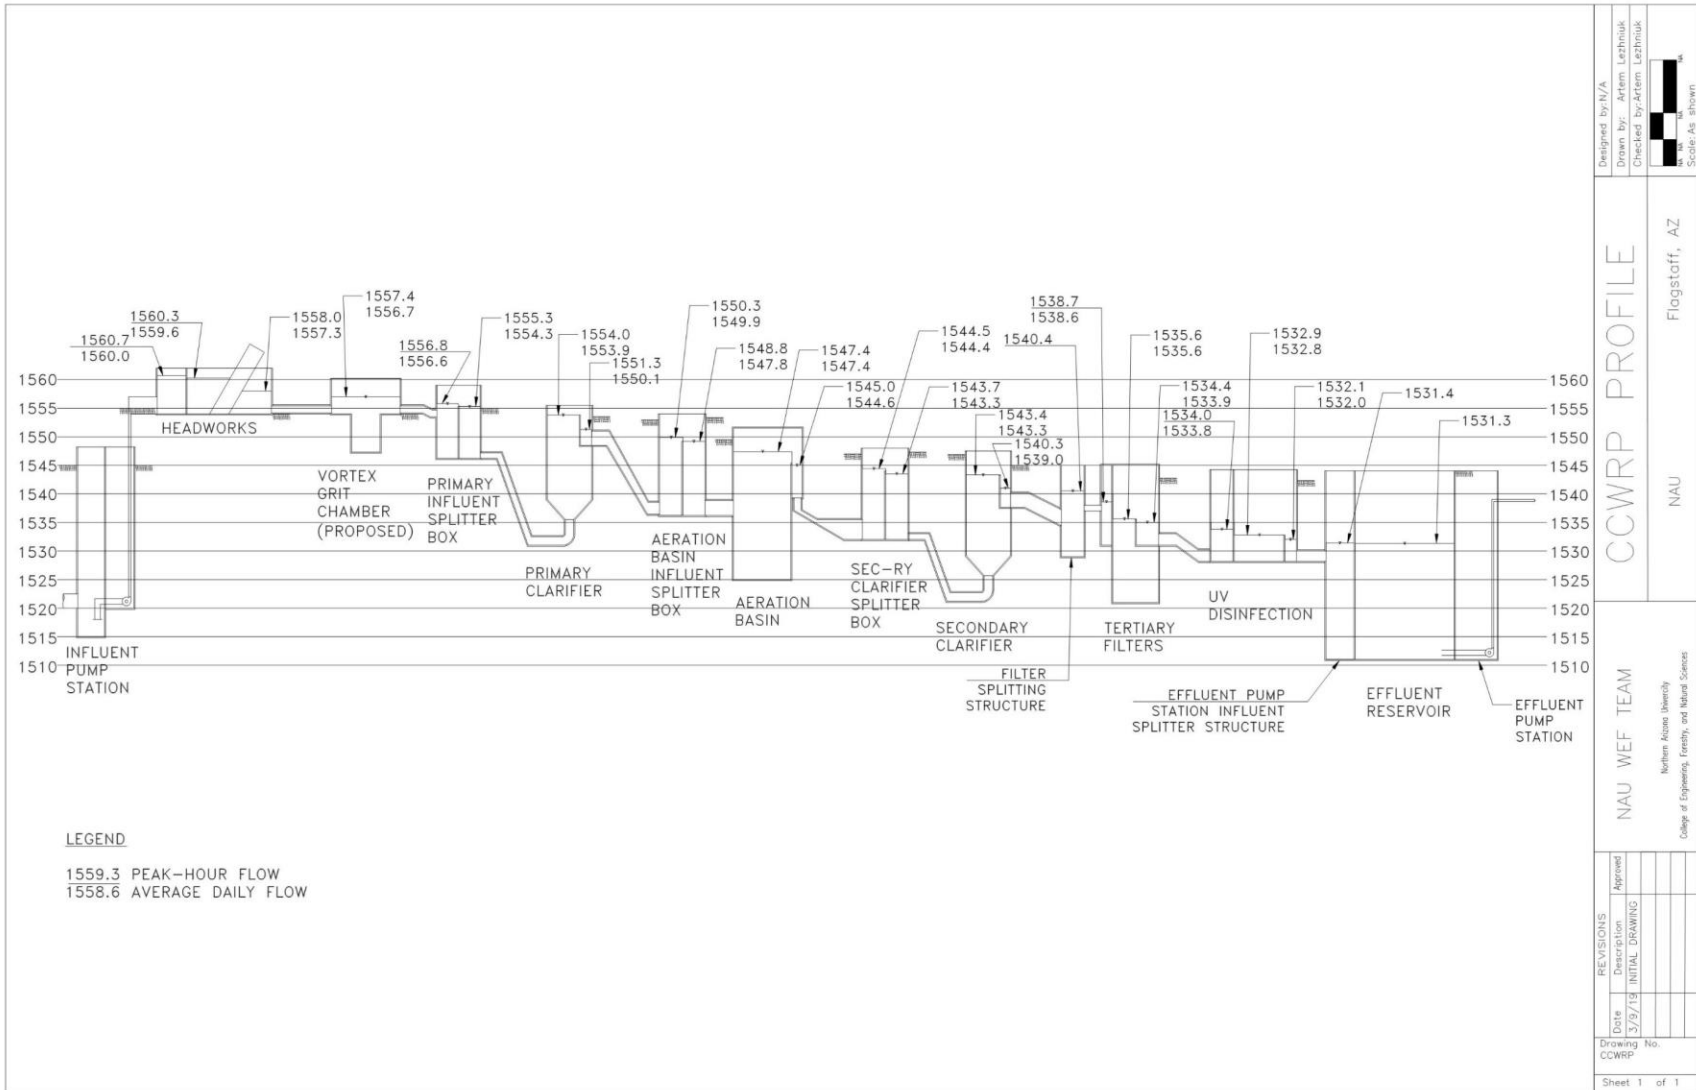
Proposed Phase 2 CCWRP Hydraulic Profile
